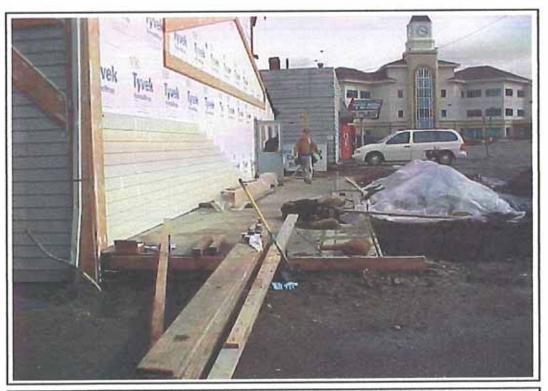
Building and sidewalk visible to left of photo. Former tank excavation visible in middle of photo in front of tarped soil pile.
